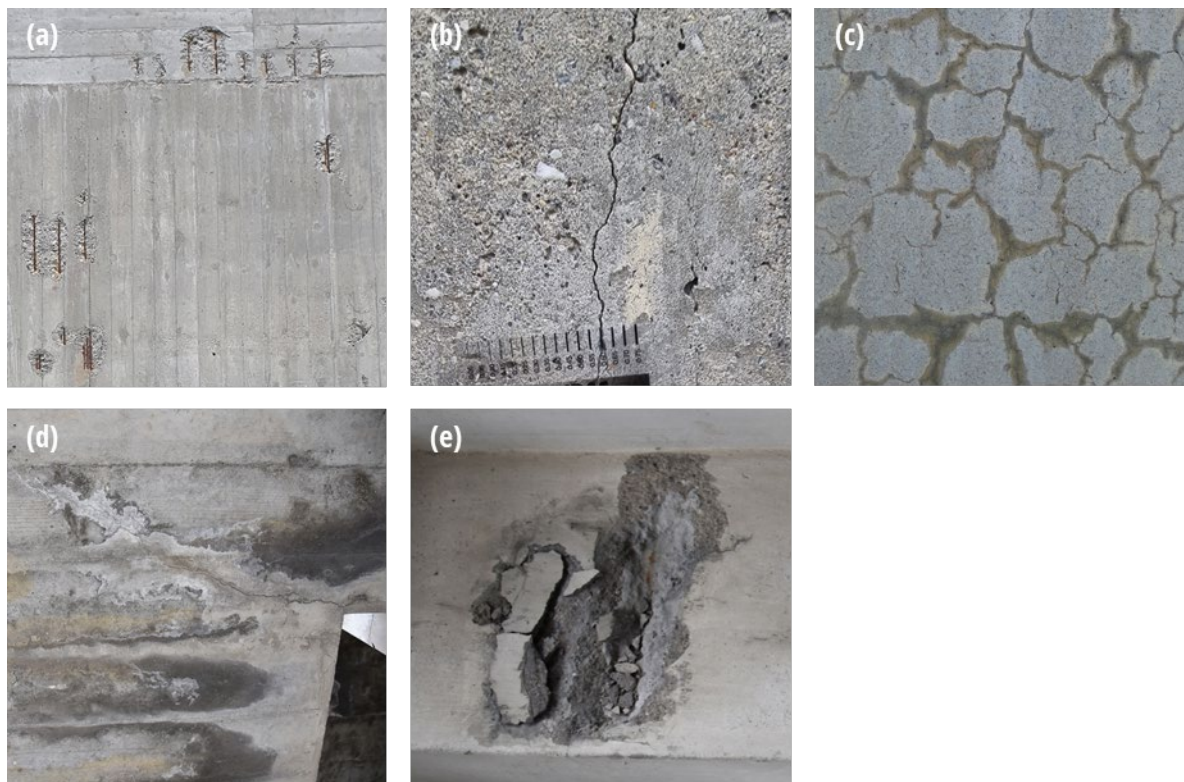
RC damages: (a) steel rebar corrosion; (b) cracking; (c) cracking pattern due to alkali-silica reaction (photo by Shinkolobwe, CC BY-SA 4.0 via Wikimedia Commons); (d) water damages; (e) concrete spalling.
